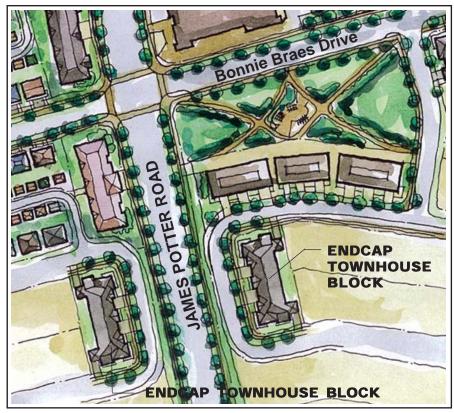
Concept plan illustrating the location of special endcap townhouse blocks.
